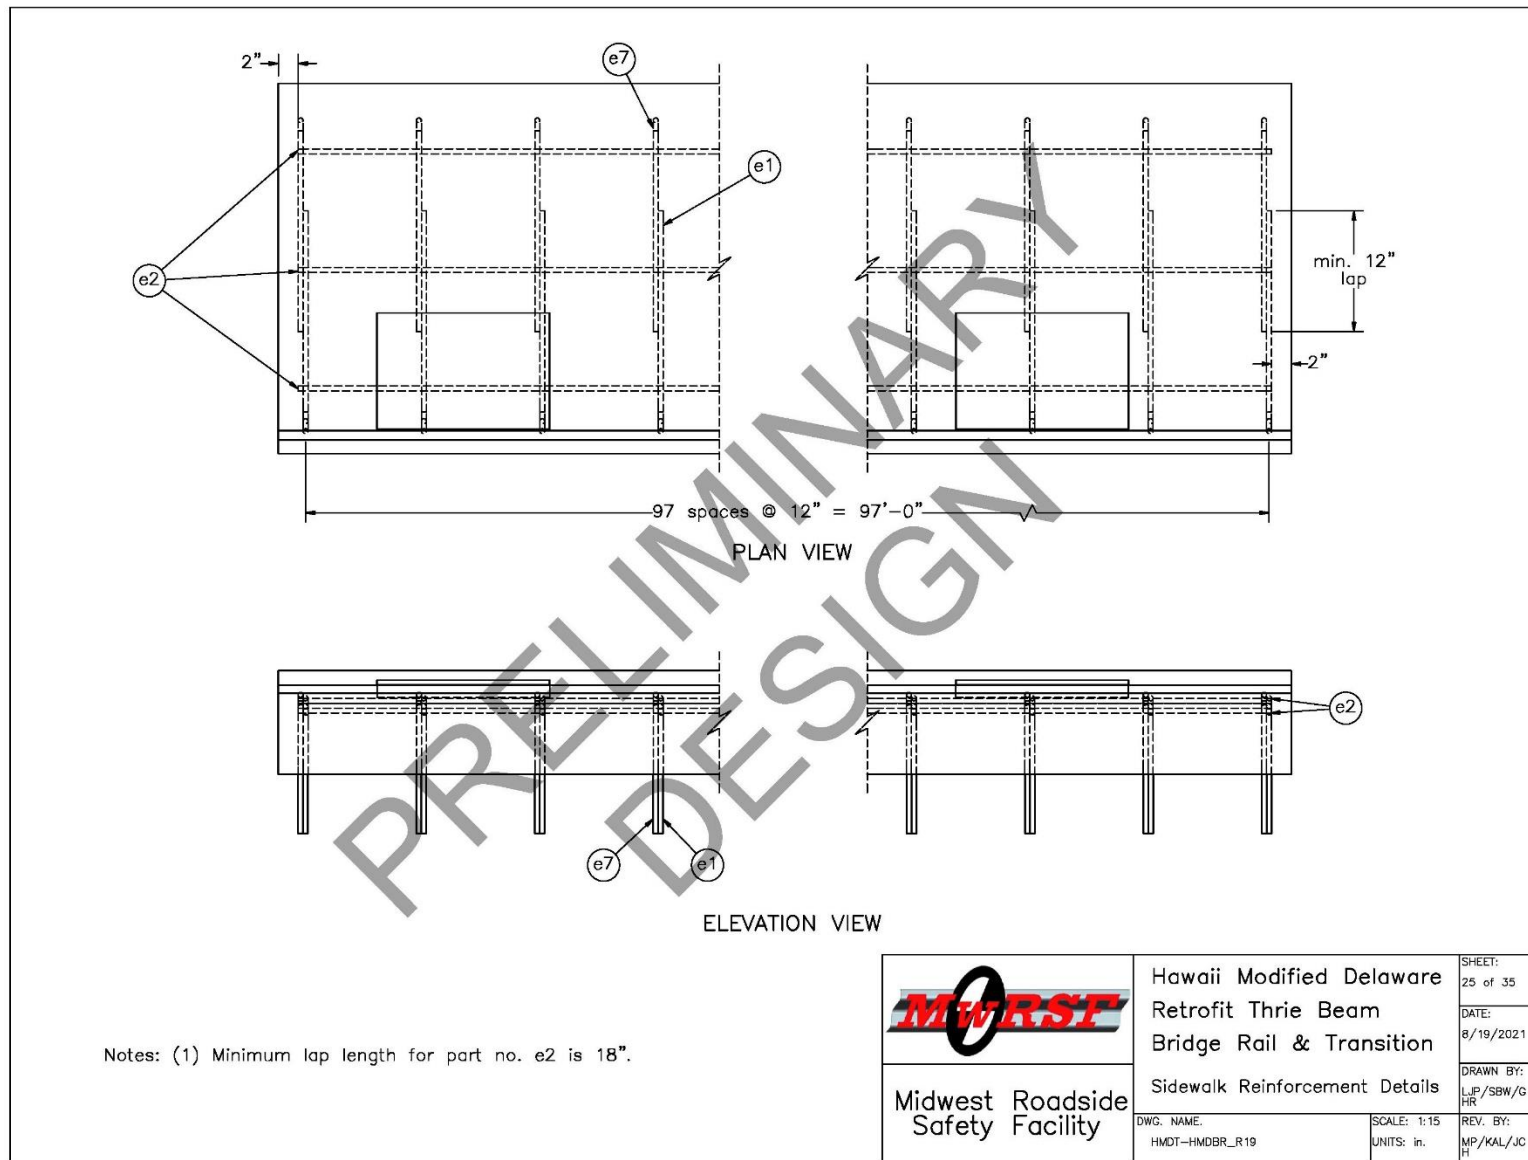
Sidewalk Reinforcement Details, Test No. HMDT-1
